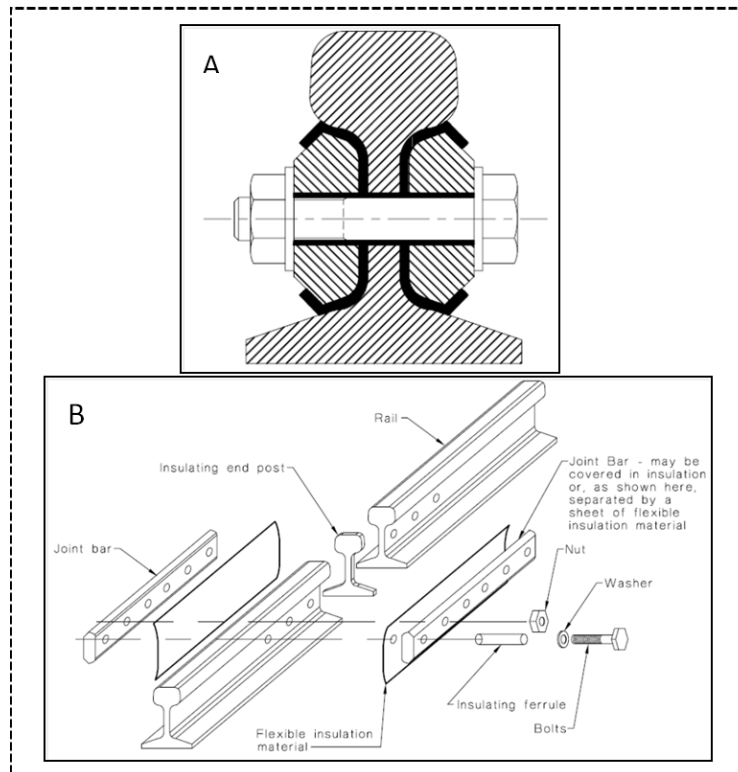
Typical insulated joint assembly. (A) Cross section, (B) Exploded view of IRJ
